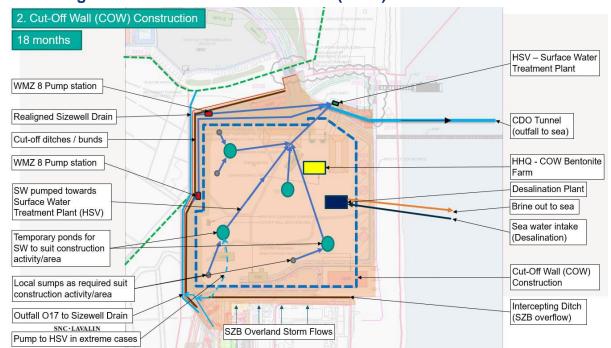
Stage 2 - Indicative surface water drainage management during construction of the Cut-Off Wall (COW)
